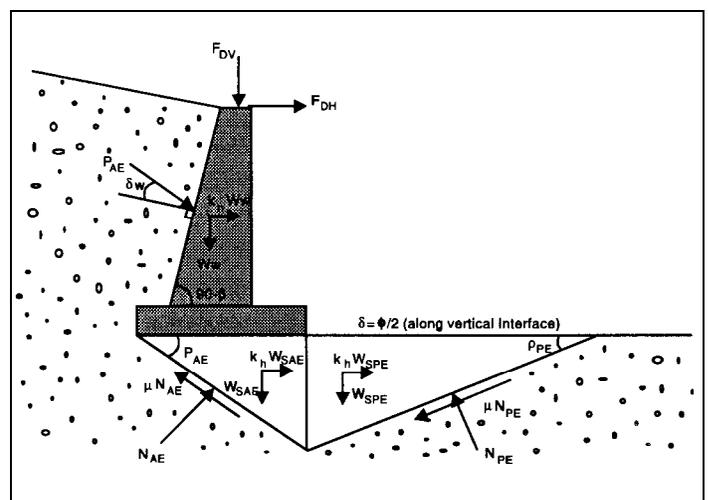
Forces Acting on a Gravity Wall Bridge Abutment
